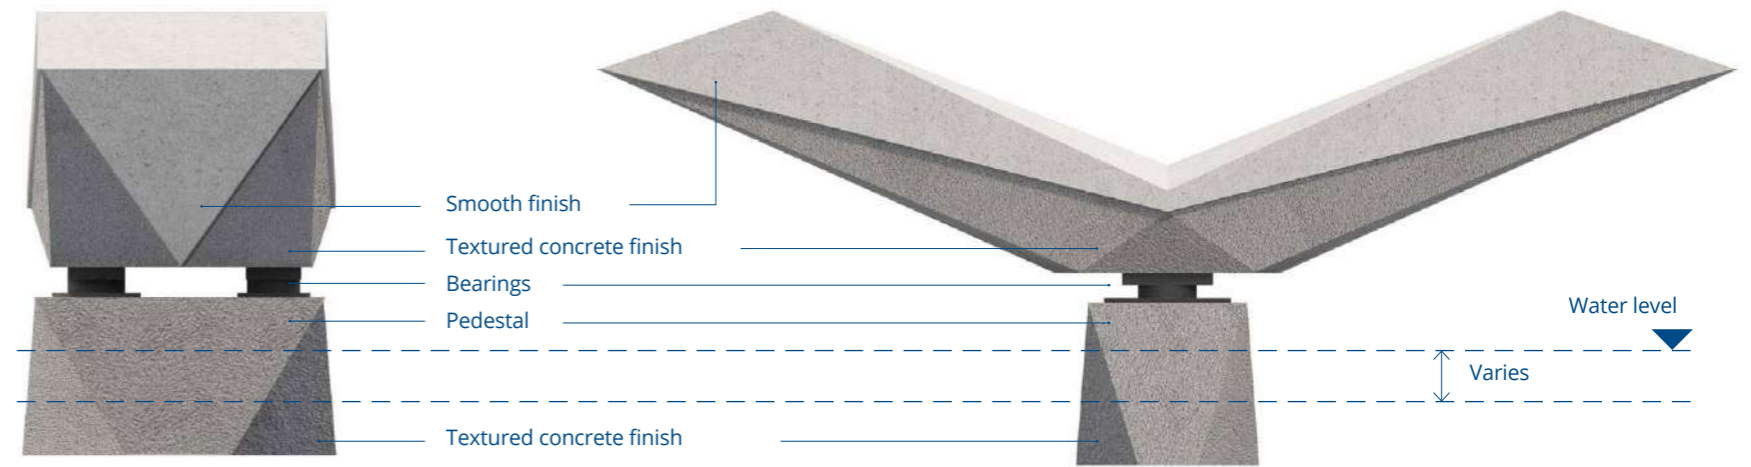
\_ Proposed elevations - Arch form deck and pedestal
